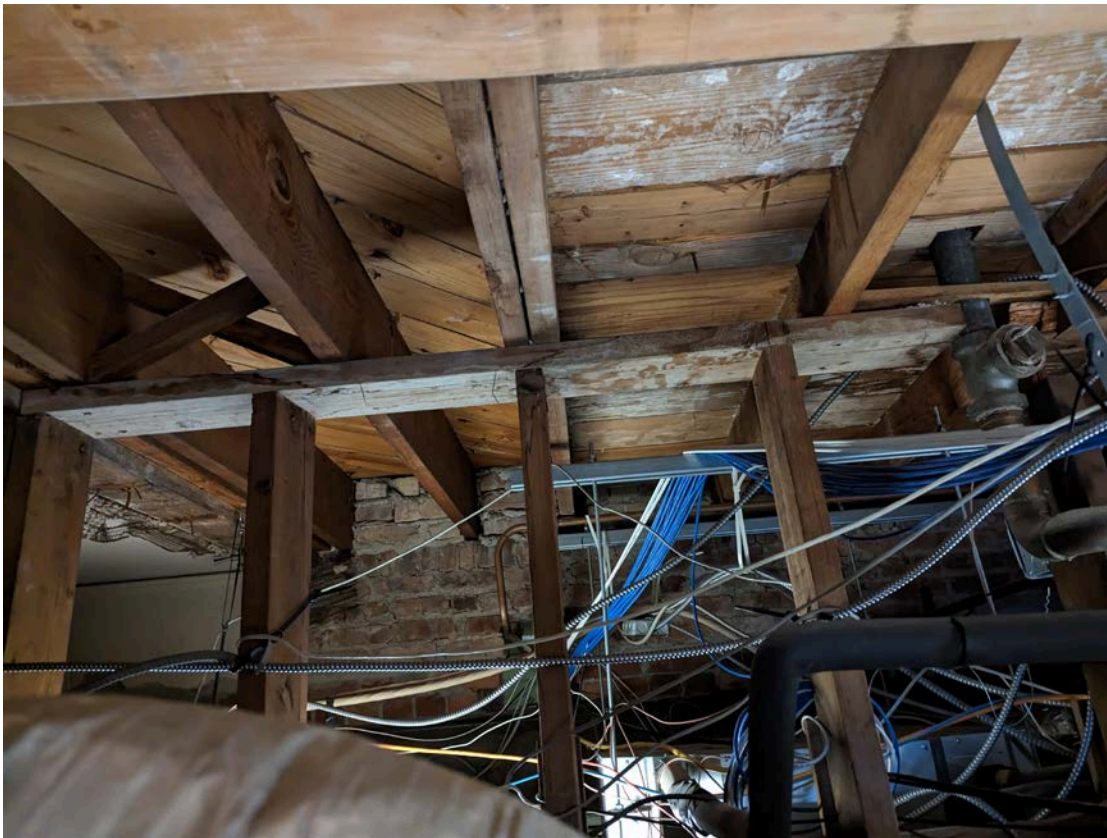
Notched Wall Plate & 2x6 Floor Joists located under Corridor/Bath Above.
